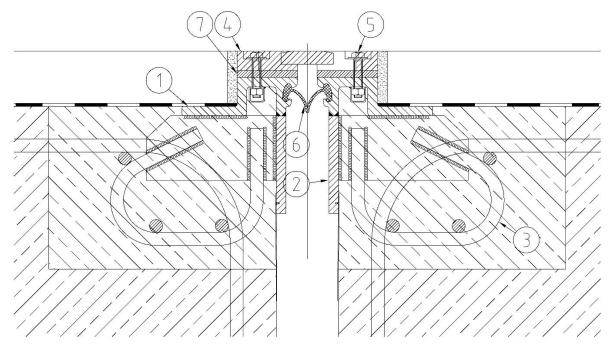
Exemplary cross section of the nosing expansion joint Fahrbahnübergangskonstruktion Typ SP/FP-elevated, including anchor loop, pavement thickness >75 mm – 150 mm
